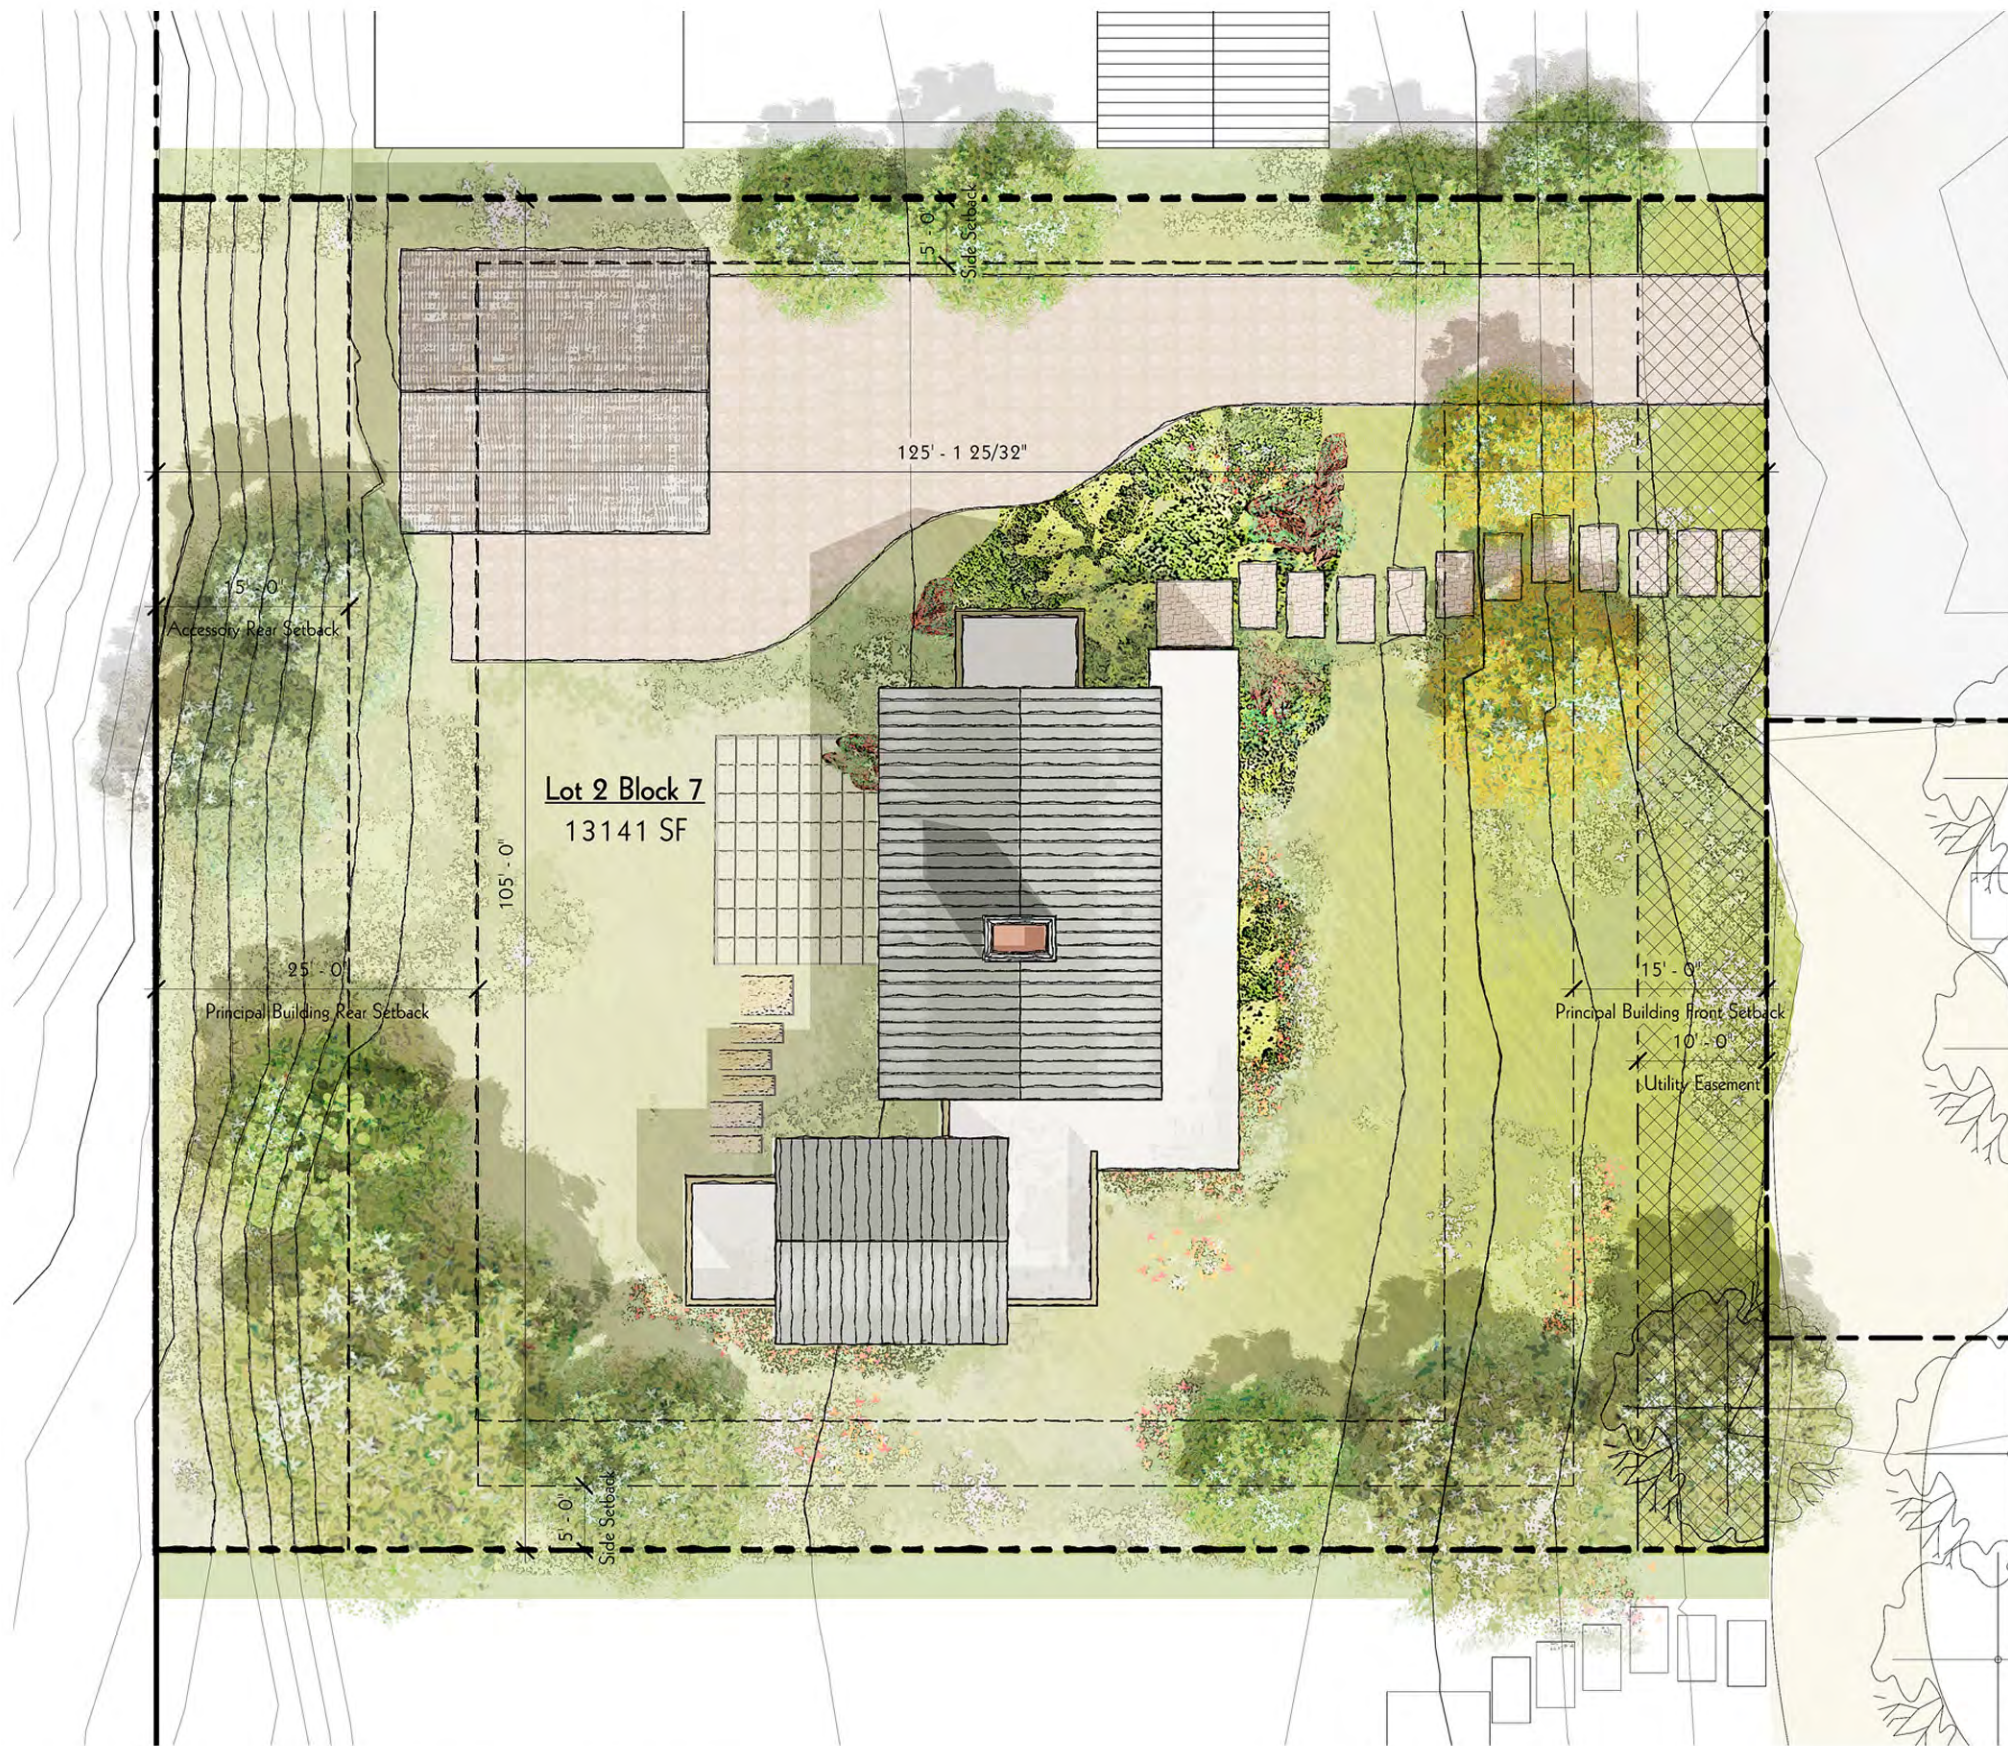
EXHIBIT L: PLAN VIEW OF COTTAGE LOT
